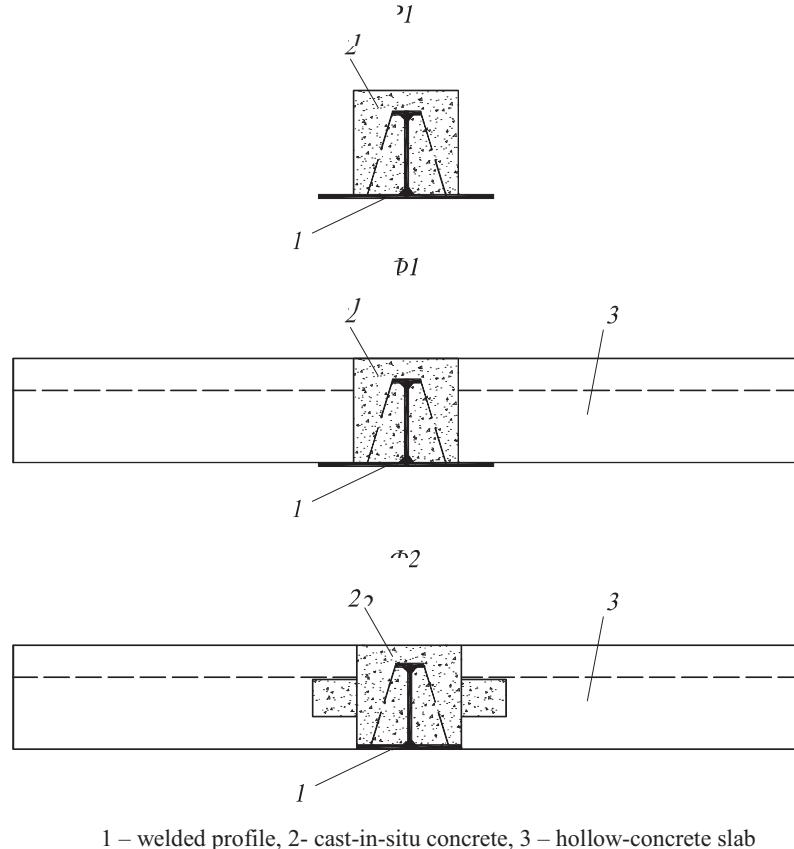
Test specimen sections: a) reference girder; b) P1 part; c) P2 part
